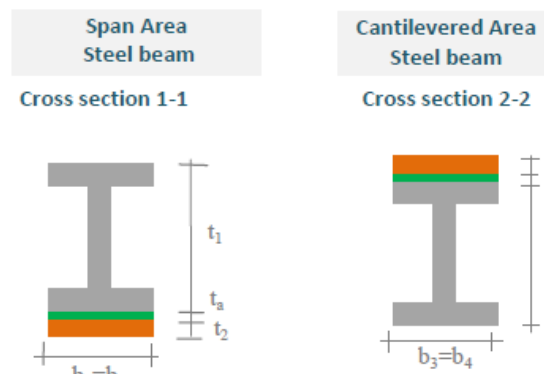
Steel beam strengthened with prestressed carbon/glass hybrid laminated plate: cross section in span and on both supports
